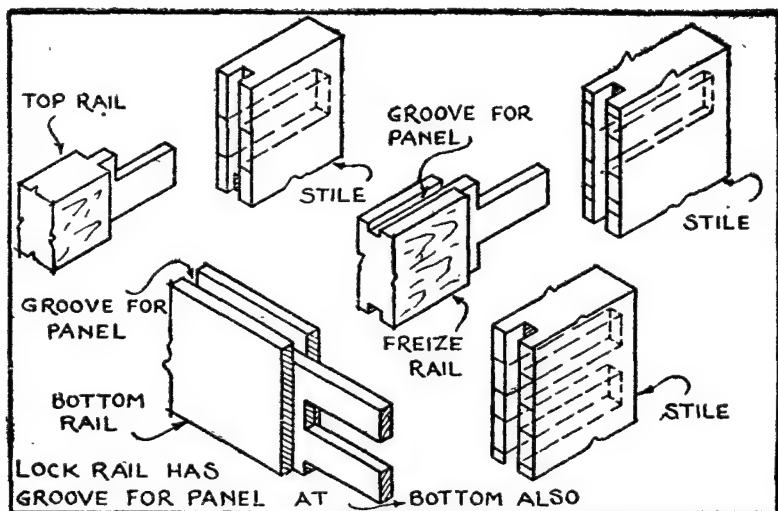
Framing Joint Haunched tenon, for top rail and stile.
